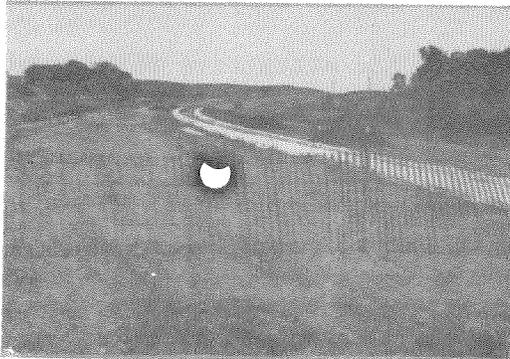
Construction of new Highway 210, looking west toward the freeway. This new access route was opened in November, 1968.
